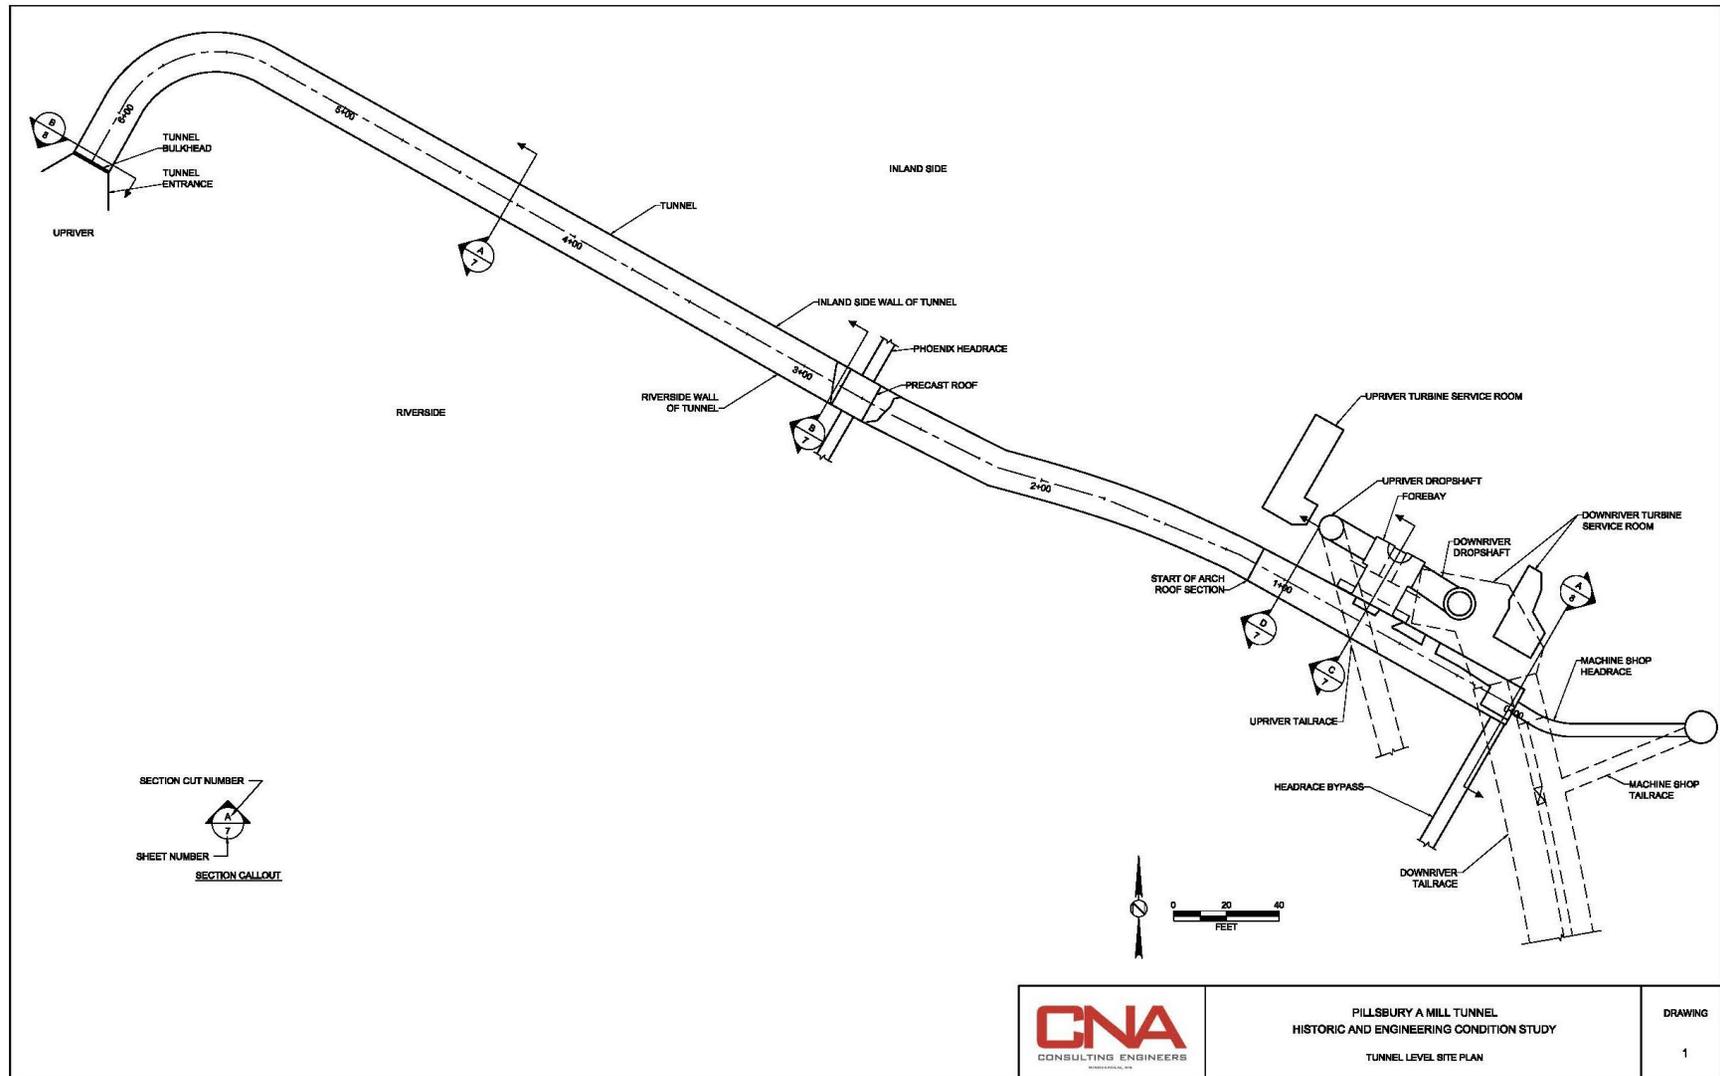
Pillsbury A Mill tunnel drawing, provided by CNA Consulting Engineers, "Tunnel Level Site Plan," 28 May 2014.
